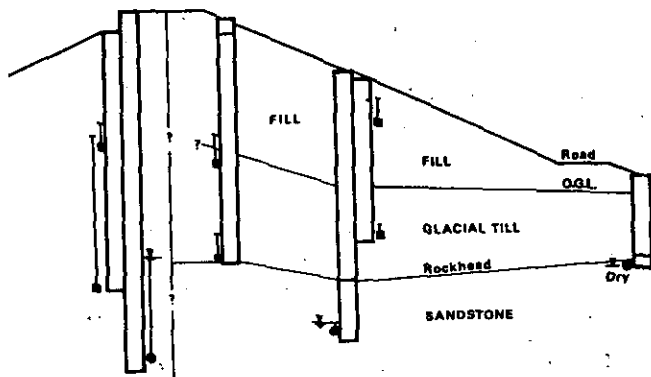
No.1 EMBANKMENT CROSS-SECTION
